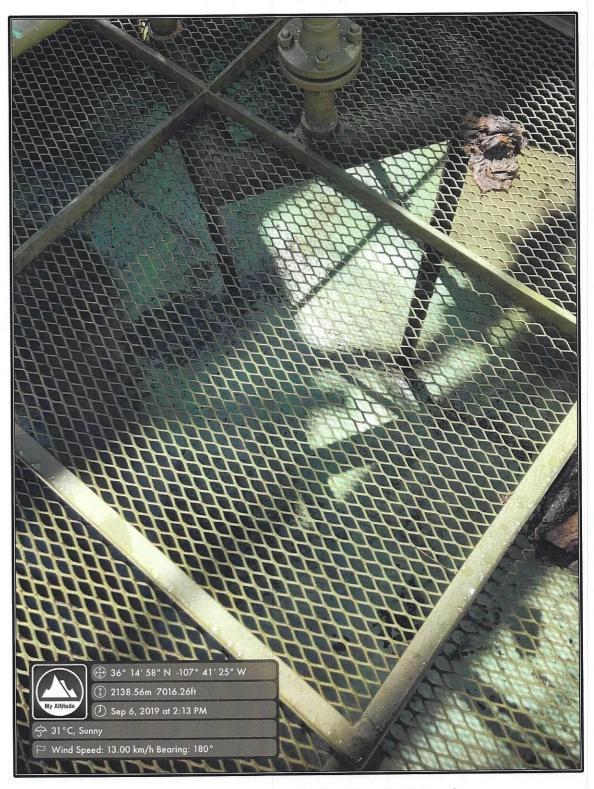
Picture of Pit Tank After Clean-Out (View 1)
